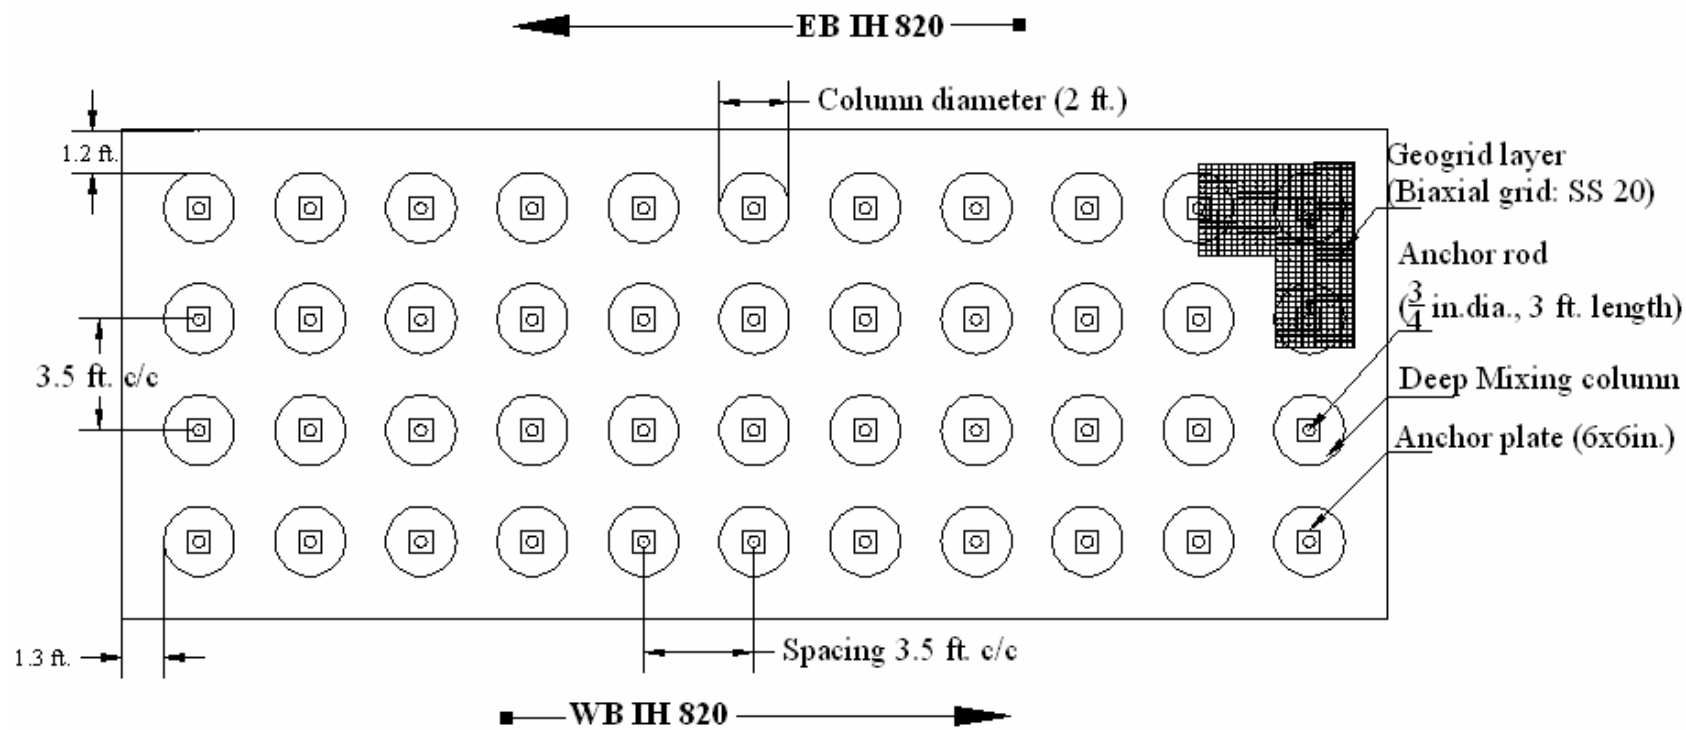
Plan view of DSM column layout of test site 1 (15 ft X 40 ft)
